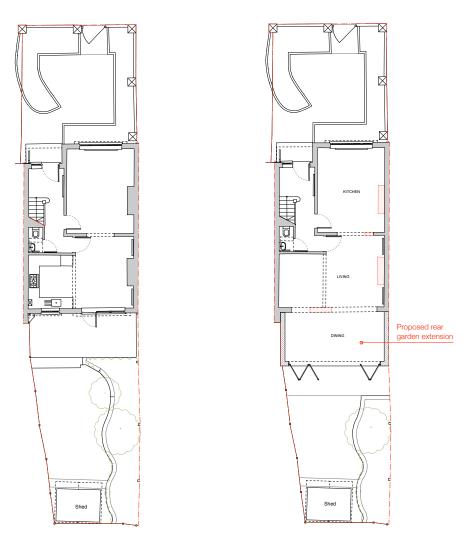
Showing existing ground floor plan (left) and the proposed rear extension (right)
